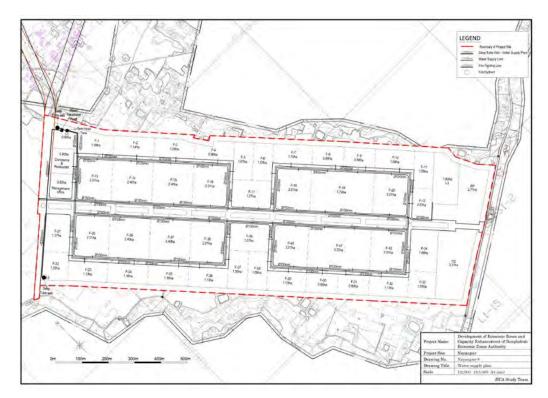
(4)-10 Nayanpur water supply plan
